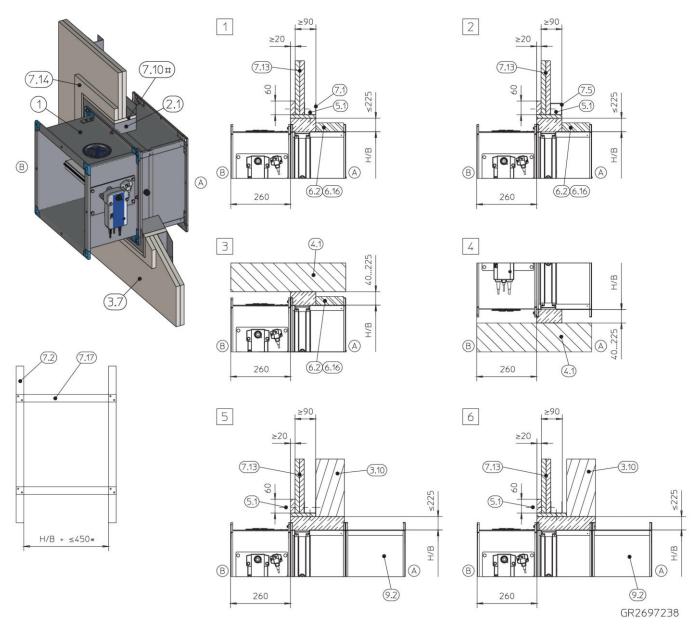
Mortar-based installation in shaft wall with metal support structure
